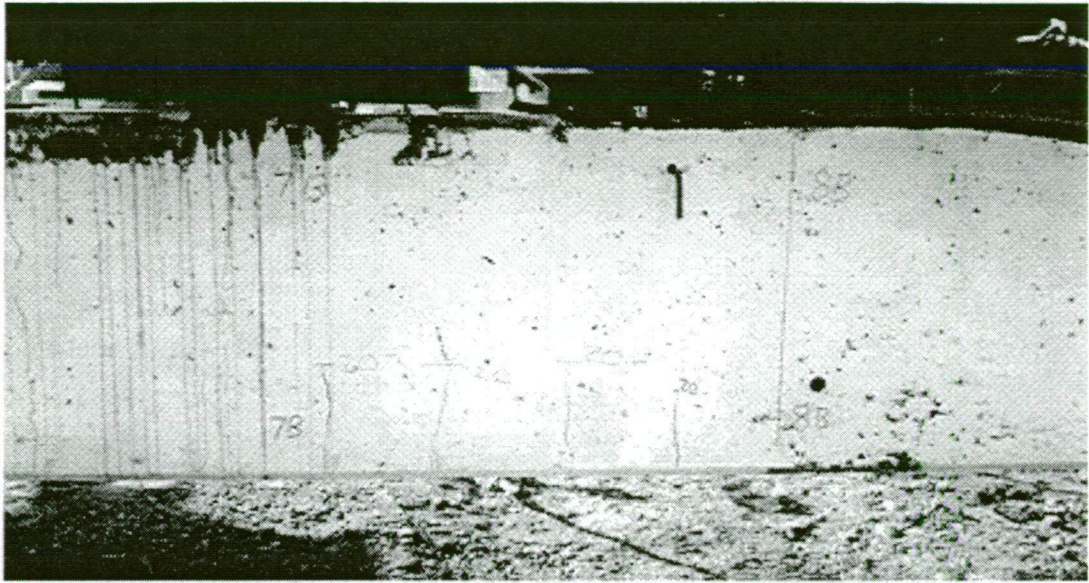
Flexural Beam Crack Patterns
